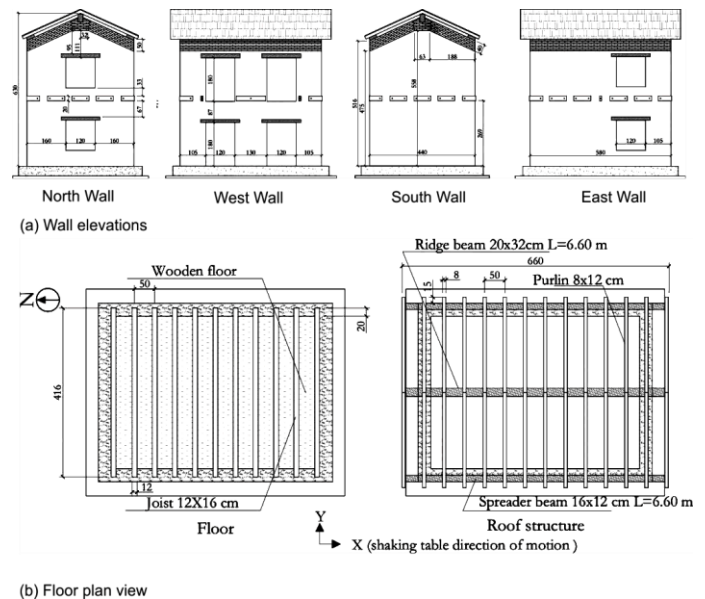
Construction details of tested building, dimensions in cm (Magenes et al. 2014)
